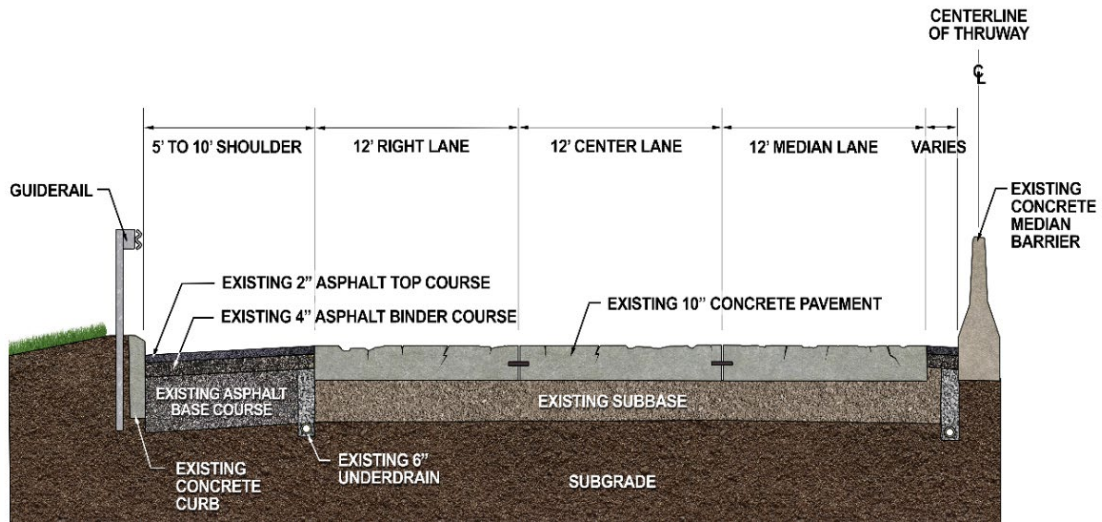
Illustrative cross section of deteriorated concrete pavement before construction
